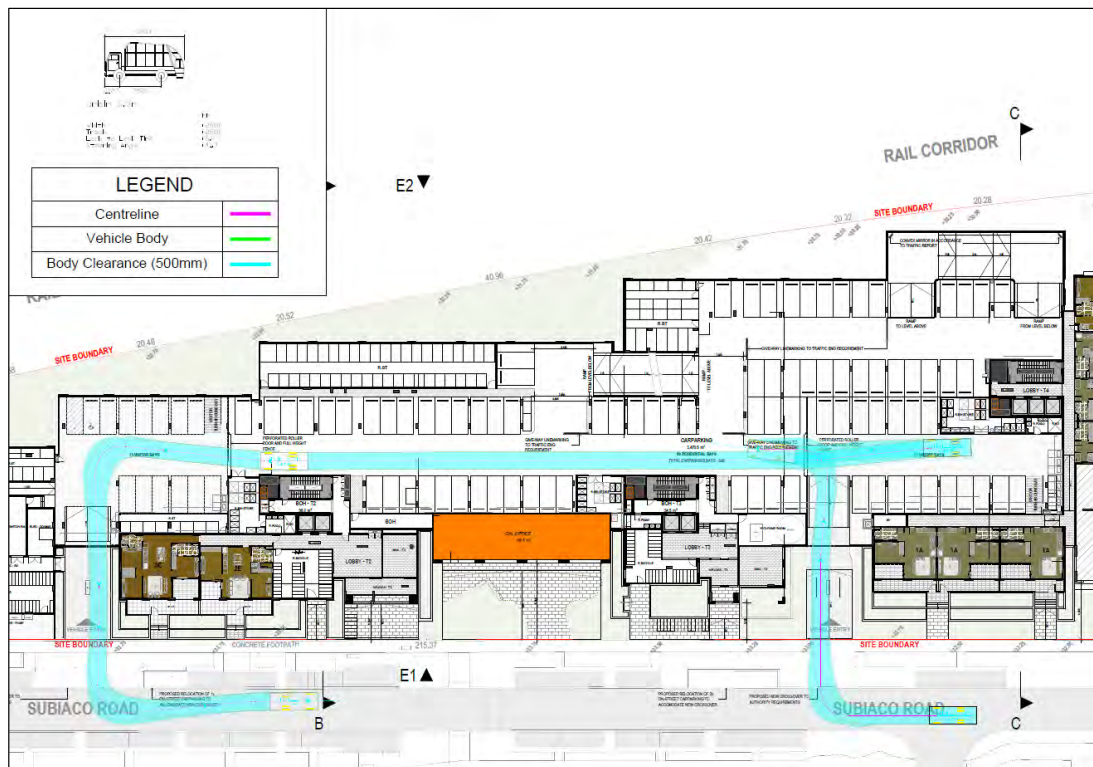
Collection of Residential Wastes at Tower 2, Tower 3 and Tower 4
